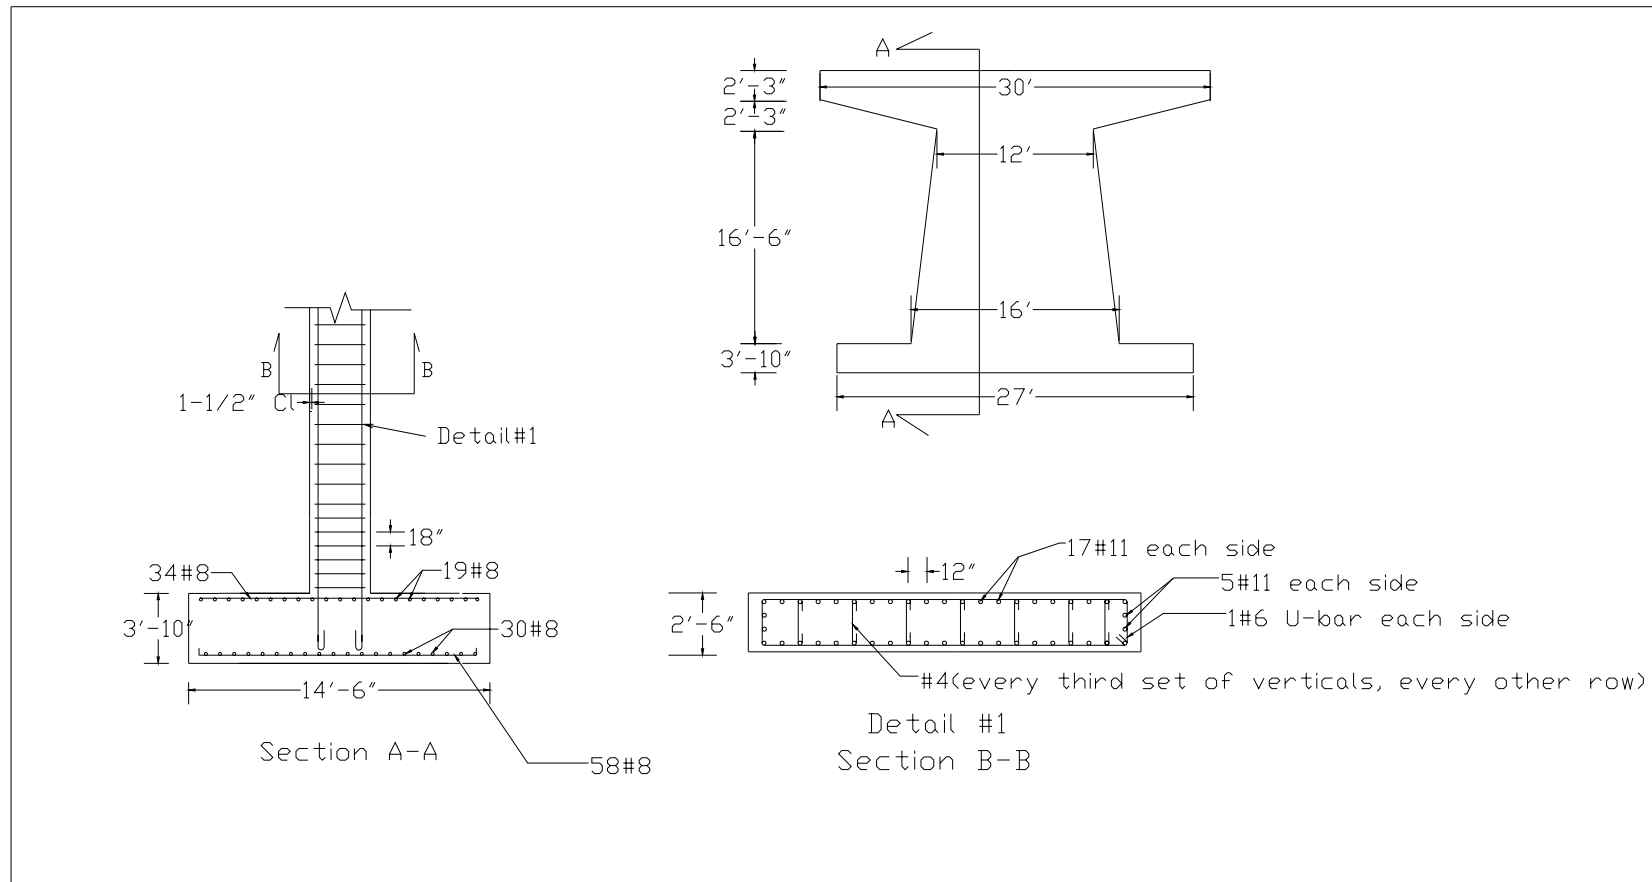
AASHTO Wall Design Details (Fixed Bent)
